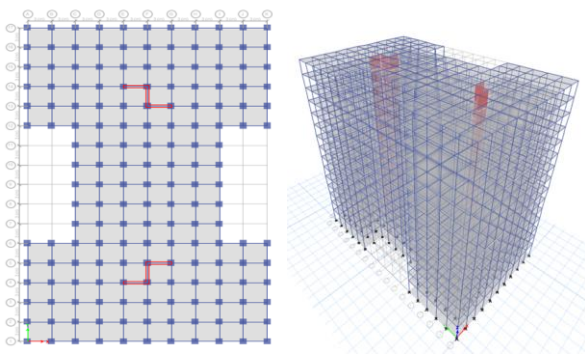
20 Storey Z-1 shear wall Building Plan & 3D view
